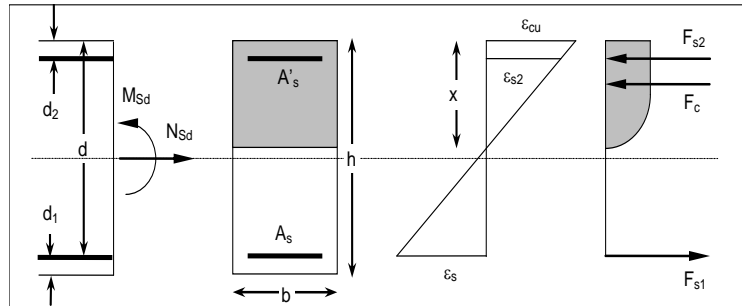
Structural design, primary lining, egress tunnel, SC E, exceptional load case
